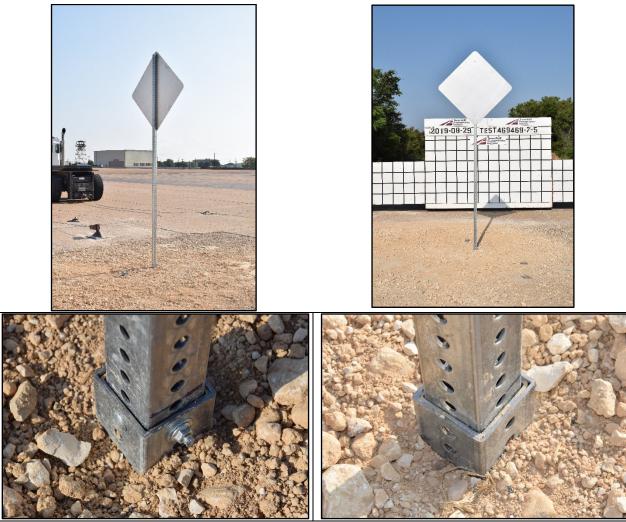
PSST Sign Support in Anchor Stub System prior to Test No. 469469-07-05.
